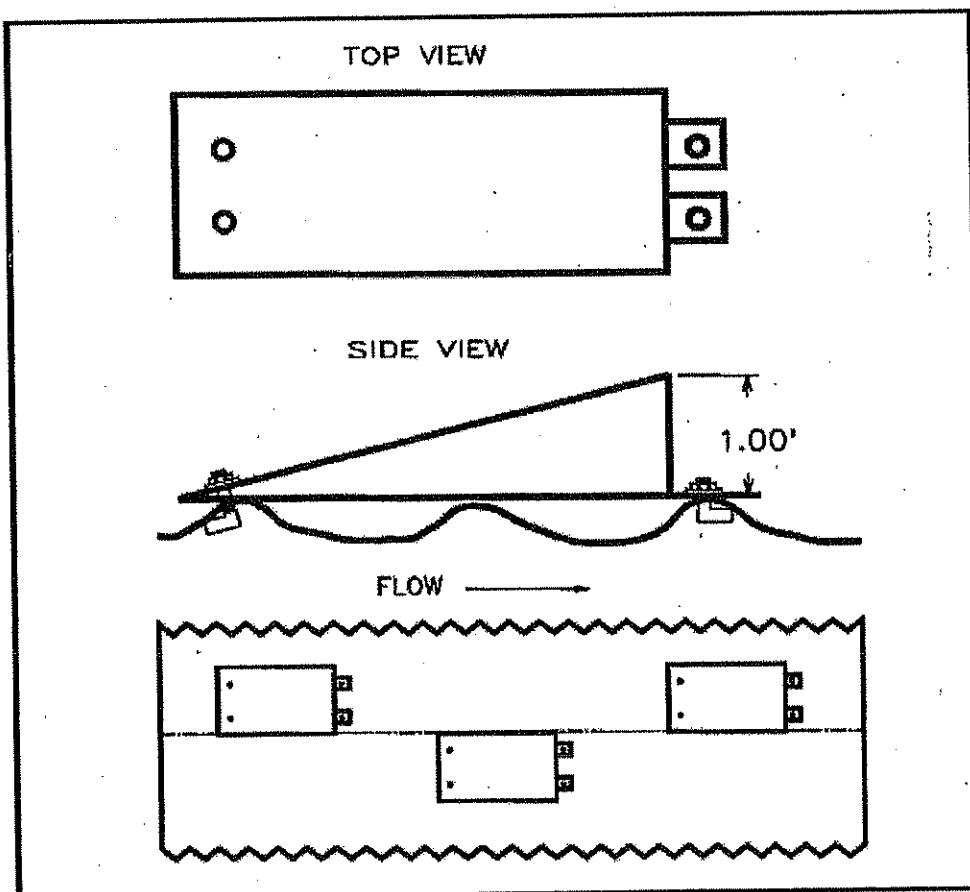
Corrugated metal pipe steel ramp baffles.
